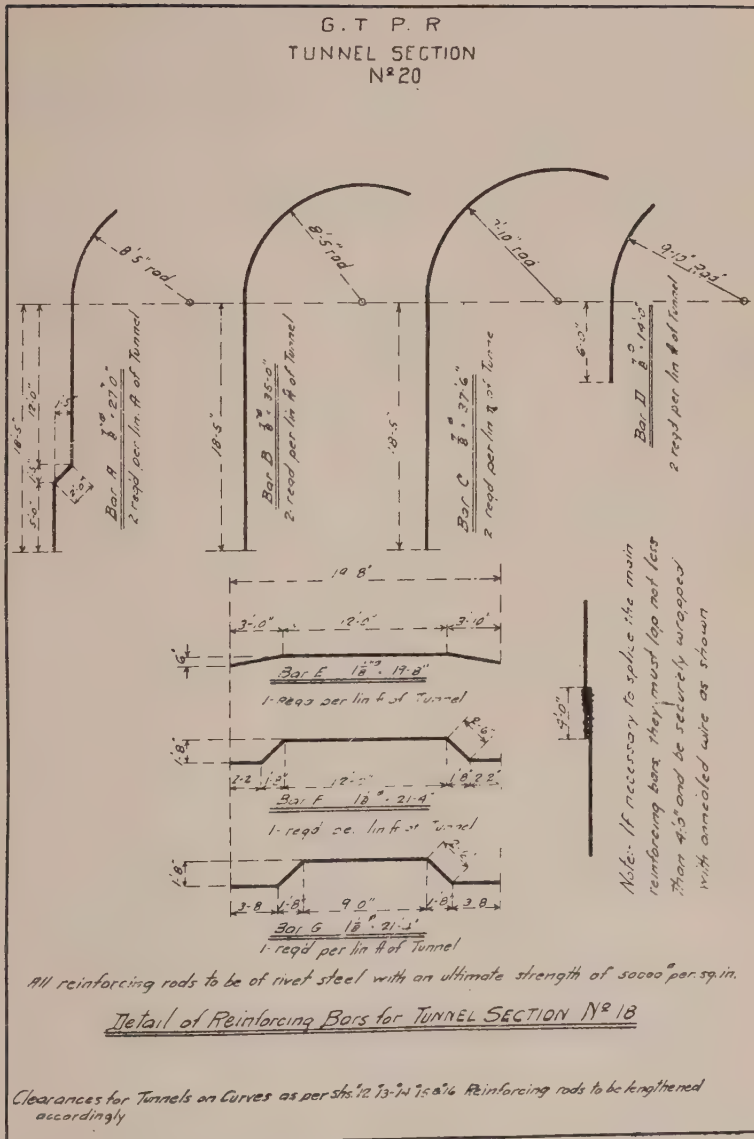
Details of Reinforcing Bars, Concrete Tunnel Lining, G. T. P. Ry.
